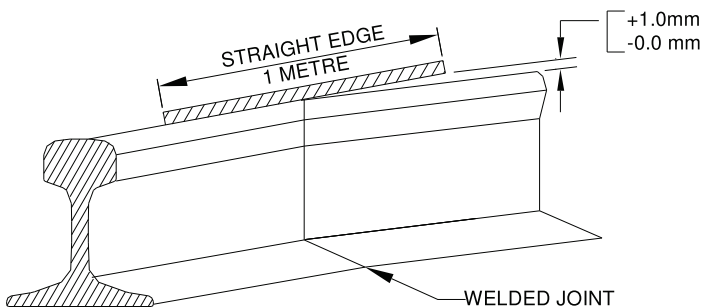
(a) Tolerance for Vertical Misalignment of Welded Joint
